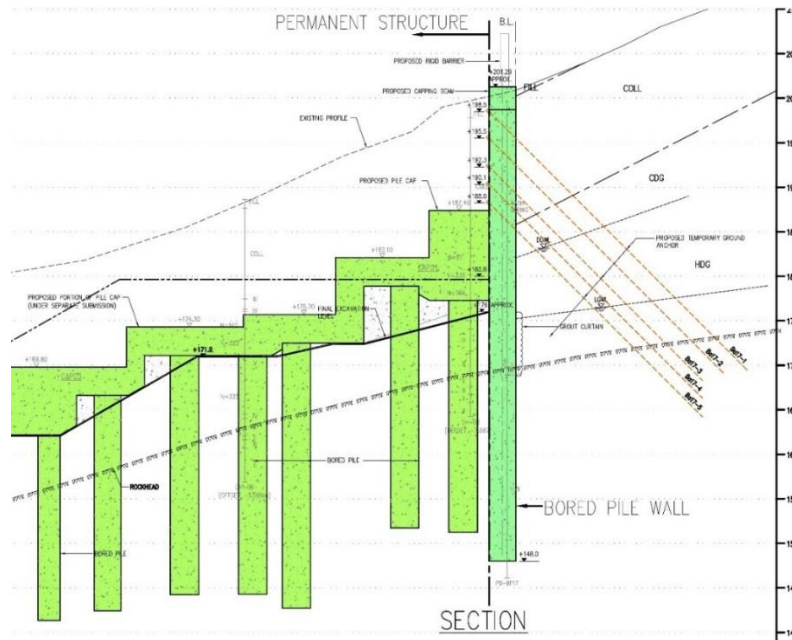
Typical Cross Section at the North Boundary of Residential Development in Tai Wo Ping
